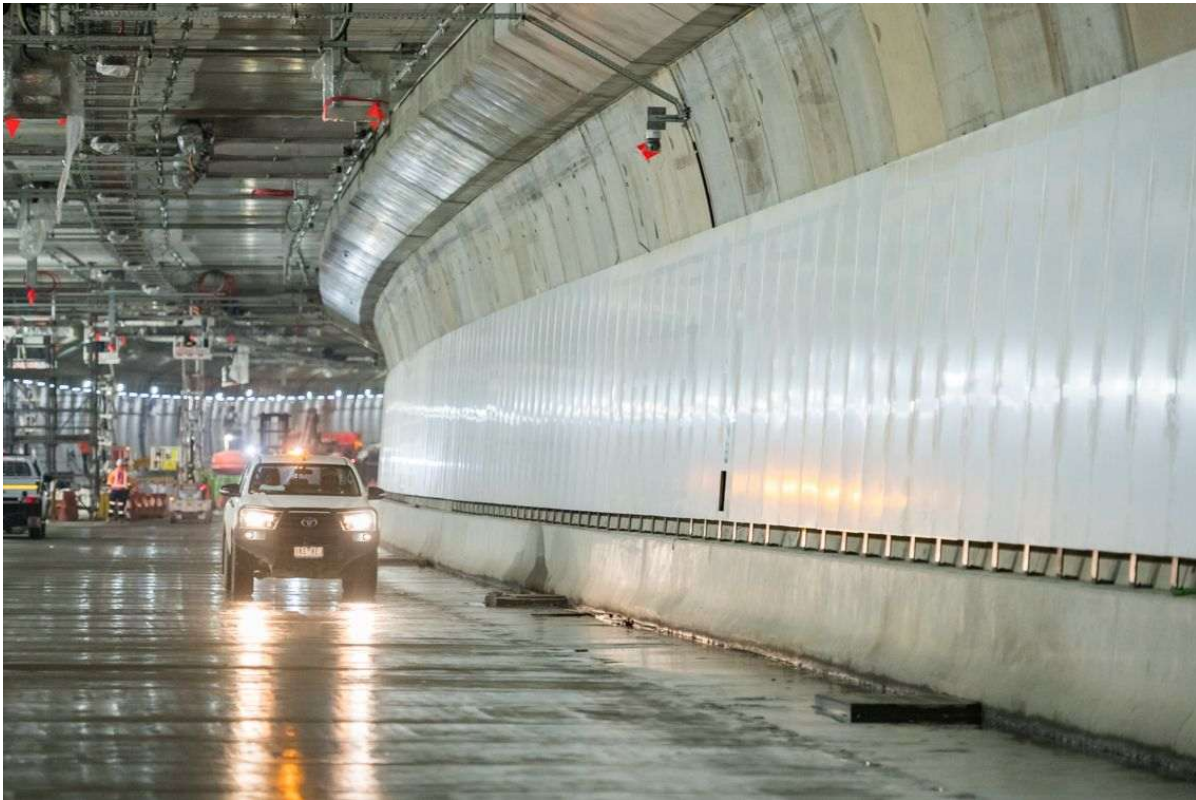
Architectural Panels - Tunnels Zone (Source: WGTP MRPV, November 2024)
